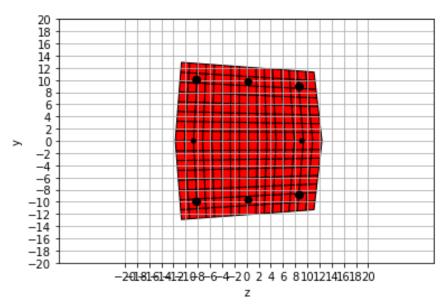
Section of 6'-3" tall cantilever column under investigation.
